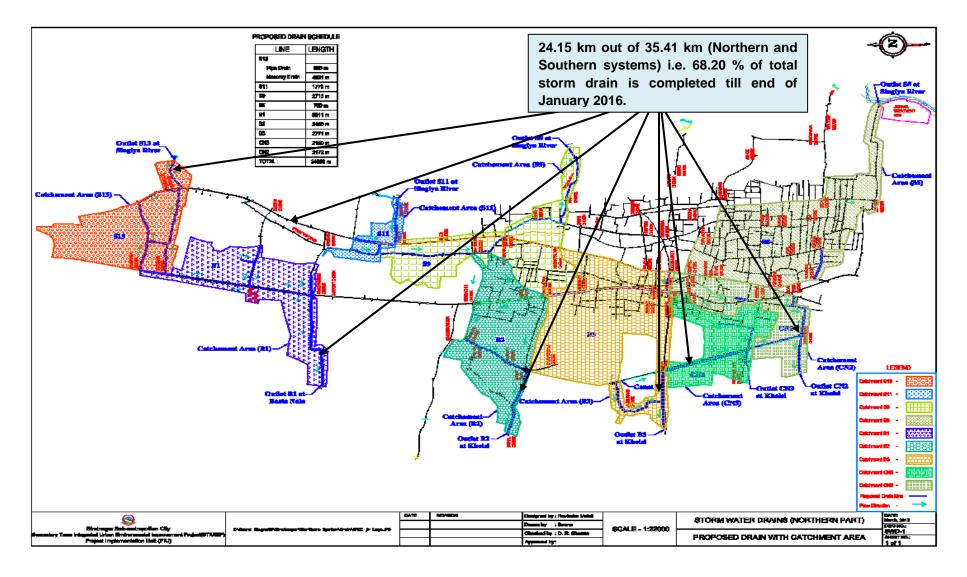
Proposed Storm Water Drains in BSMC (Northern Drainage System)
